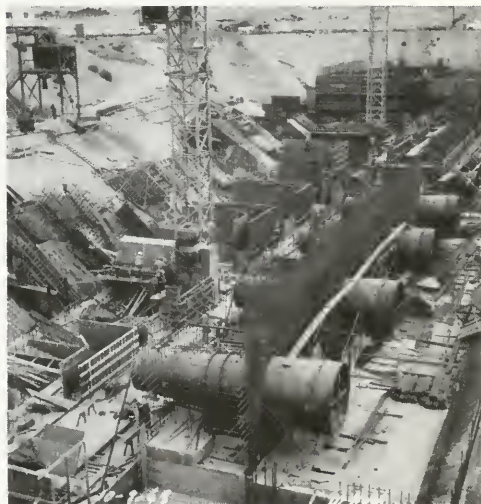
Concrete Placement of Taper Sections Near Bottom of Plant
